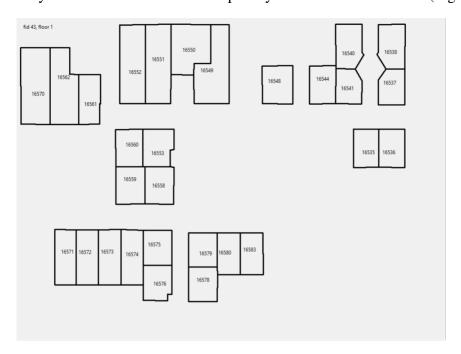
Partial Reconstruction of Facility 43 Floor 1, labeled polygons correspond to rooms
